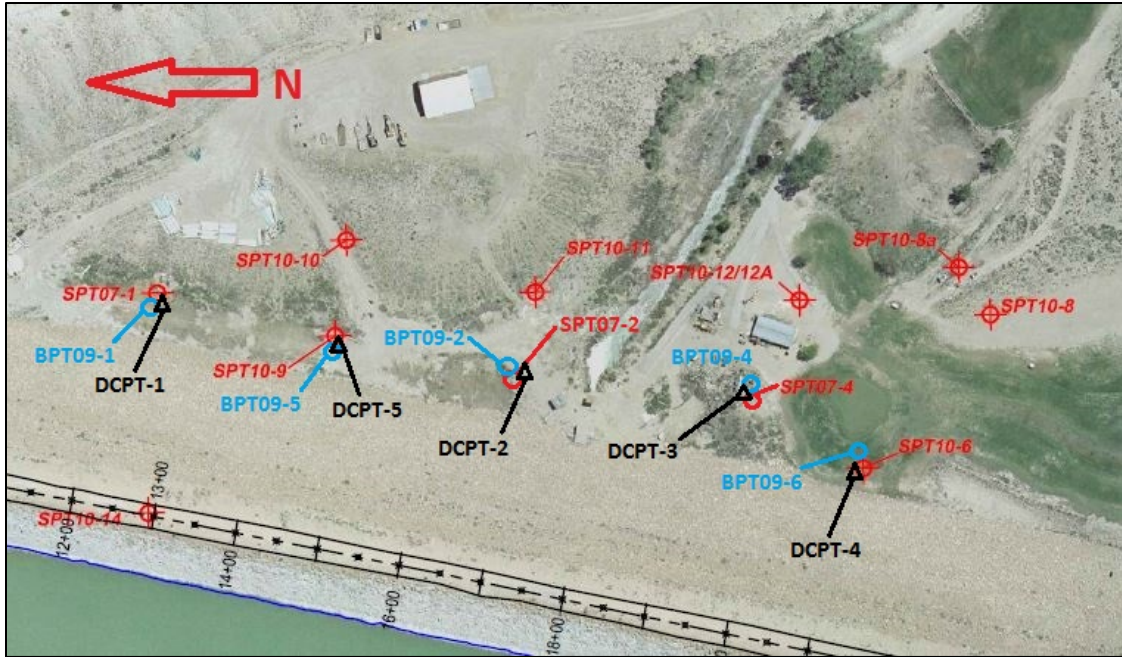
Plan view of layout at Millsite Dam site showing test sites from previous drilling and location of DPT soundings.
